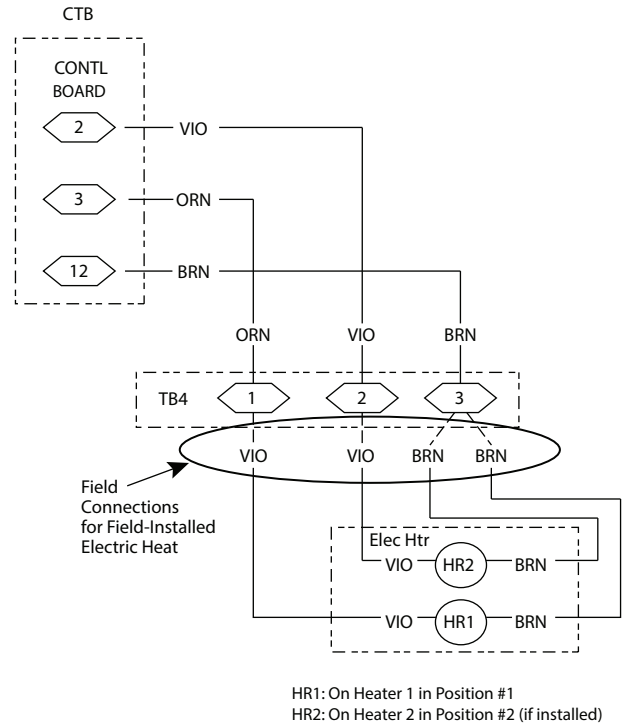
Accessory Electric Heater Control Connections (all units except size 06, 575-v) - 2 Stage Heat Shown
